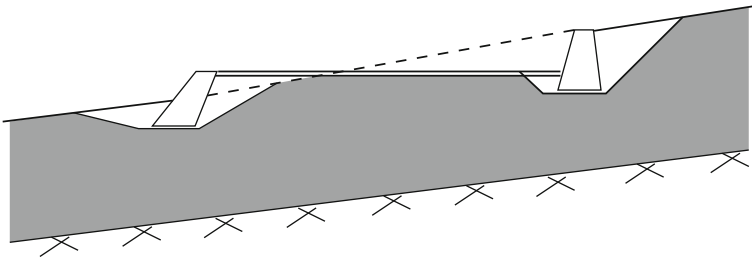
Terrace with retaining walls at an inclined peloid layer
